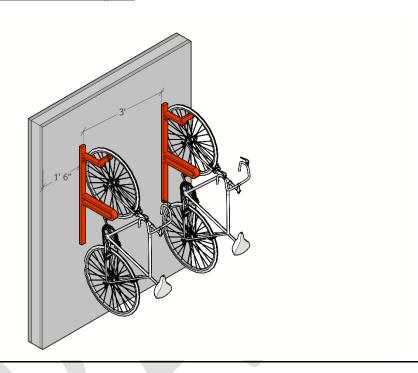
Wall-mounted bicycle racks with vertical off-sets
